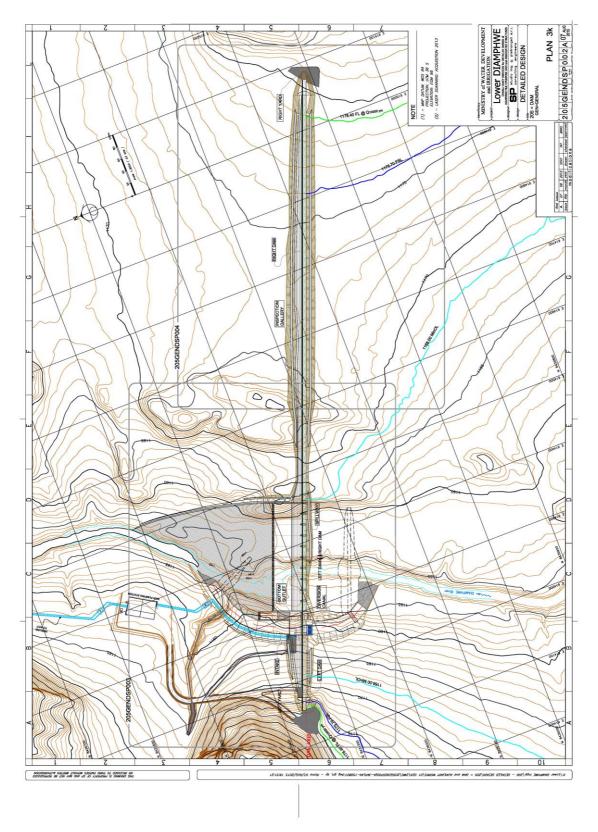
Plan of Dam Wall (Ref. SP 2015)
